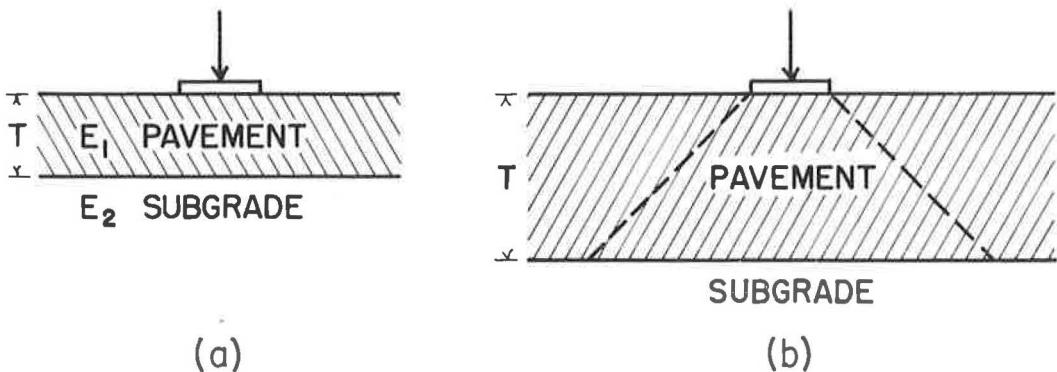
Evolution of flexible pavement structural design: (a) layered system slab action, and (b) conventional flexible pavement.
